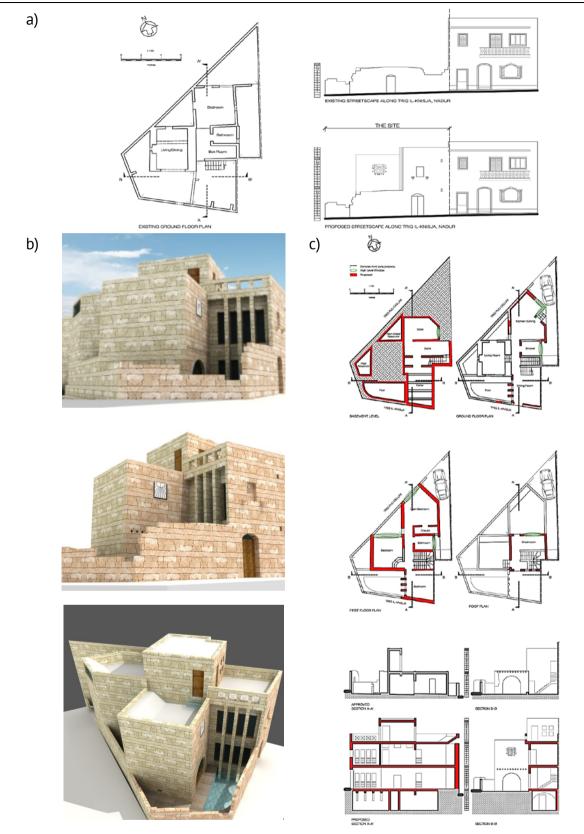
House of character, Nadur (online version is in colour): a) original plan, original and proposed elevation; b) computer generated models; c) design interventions [5].
